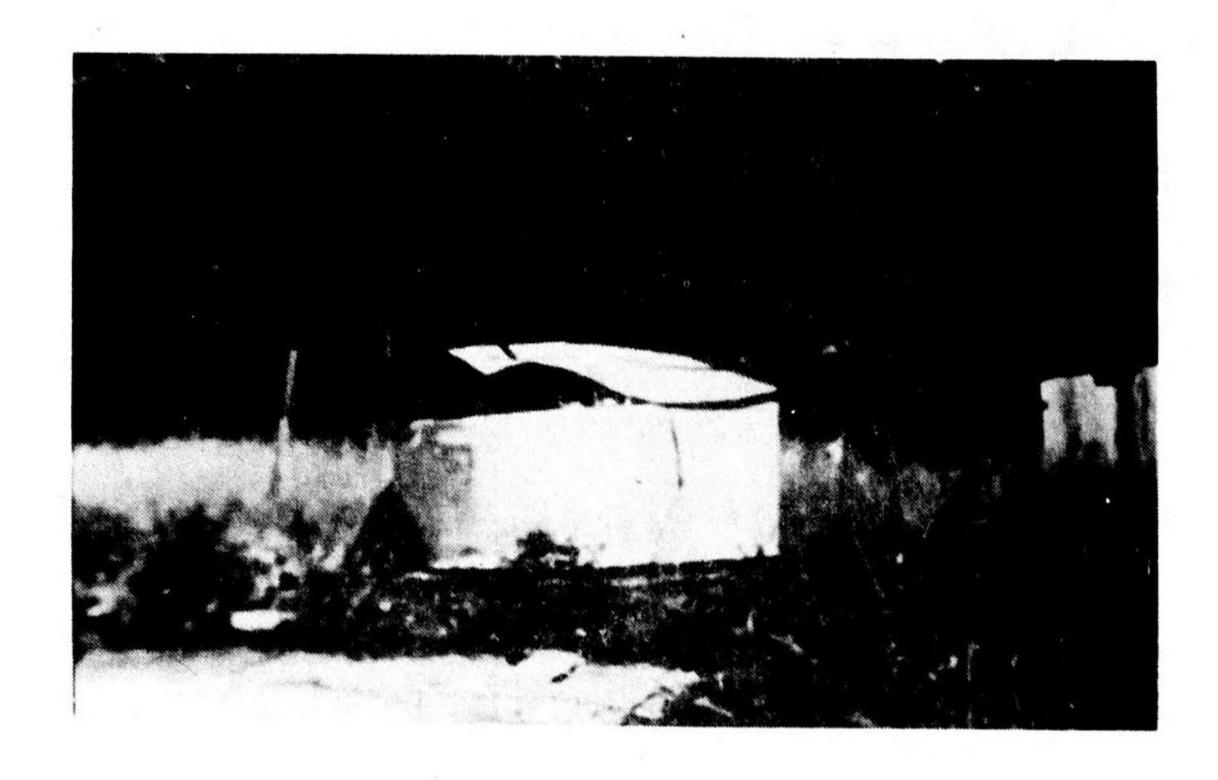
(b). Tank No. 2, filled with oil, explosion 1 ft from edge.
